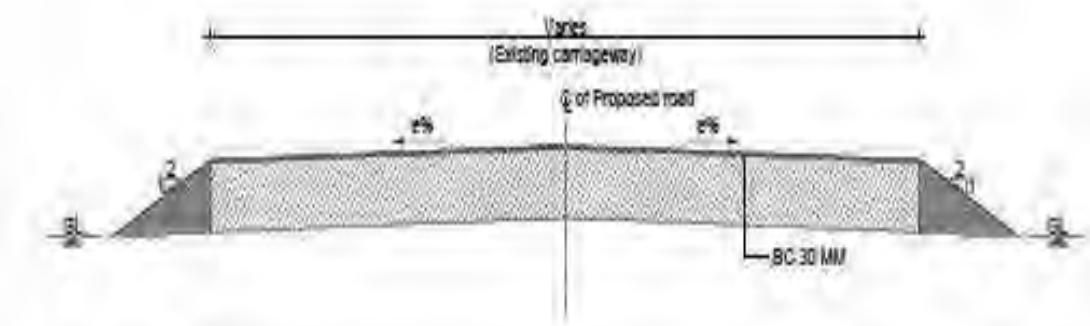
TCS-10 TCS For Overlay on Existing Road
